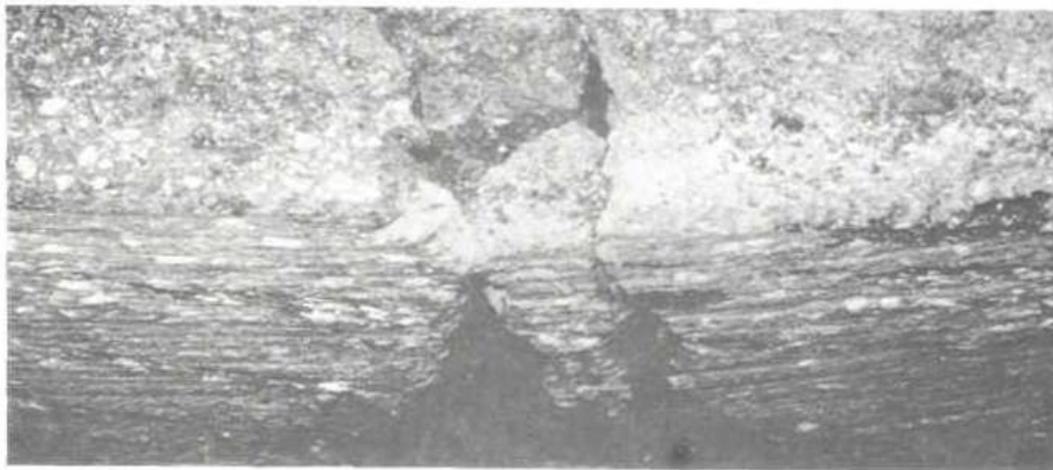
Photograph of vertical profile of a crack. Note the transverse crack width at the pavement surface in the center of the upper half of the photograph. The crack flares out downward. Loosely held rubble like material in the center of the deteriorated area (Ramamurti and Jayaprakash 1987).
